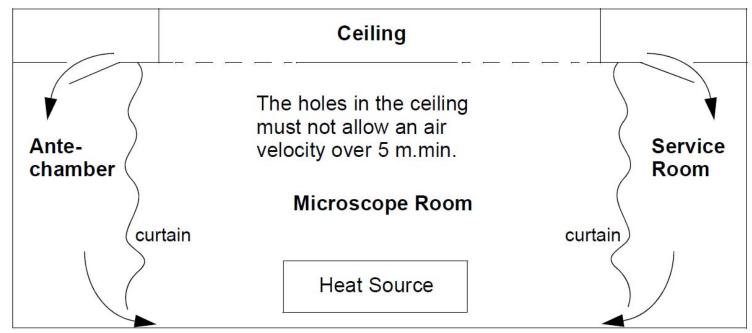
Cross Section of TEM Room - Air Circulation
